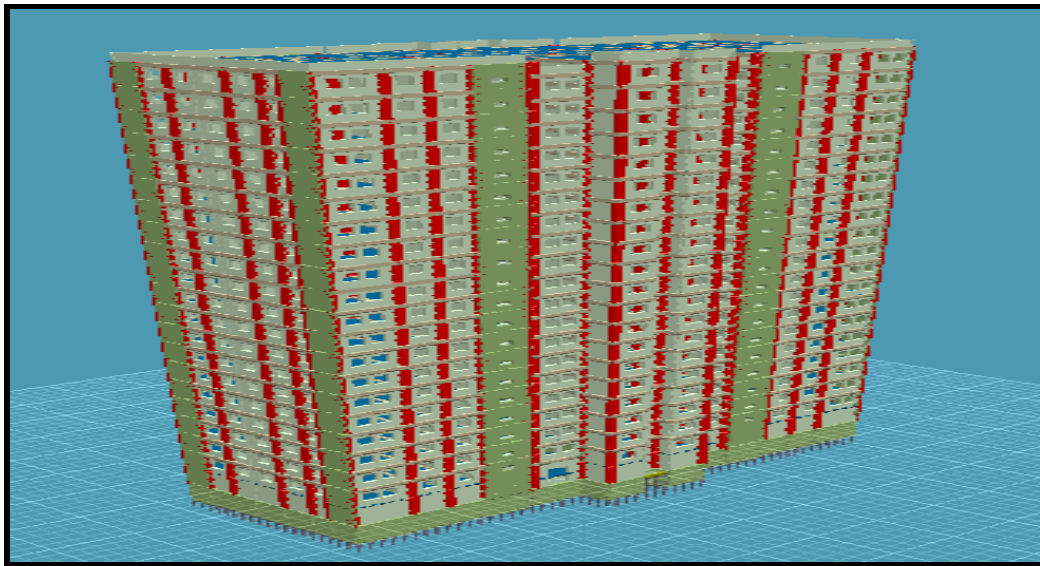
The 3D view a building with Twenty Stories and Stiffened Coupled Shear Wall System
